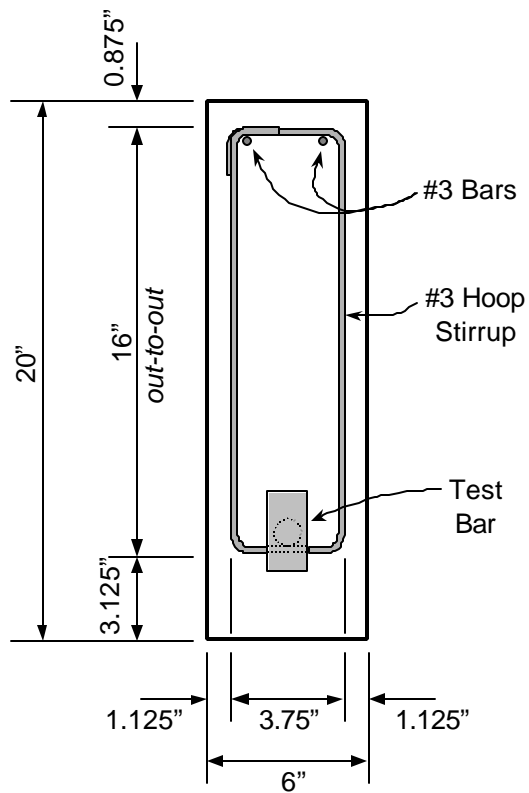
Cross-section of confined specimen and stirrup geometry
